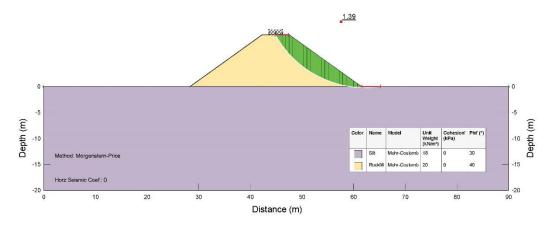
Slope stability of rockfill embankment over silt, 10 m fill – Min FOS = 1.4
